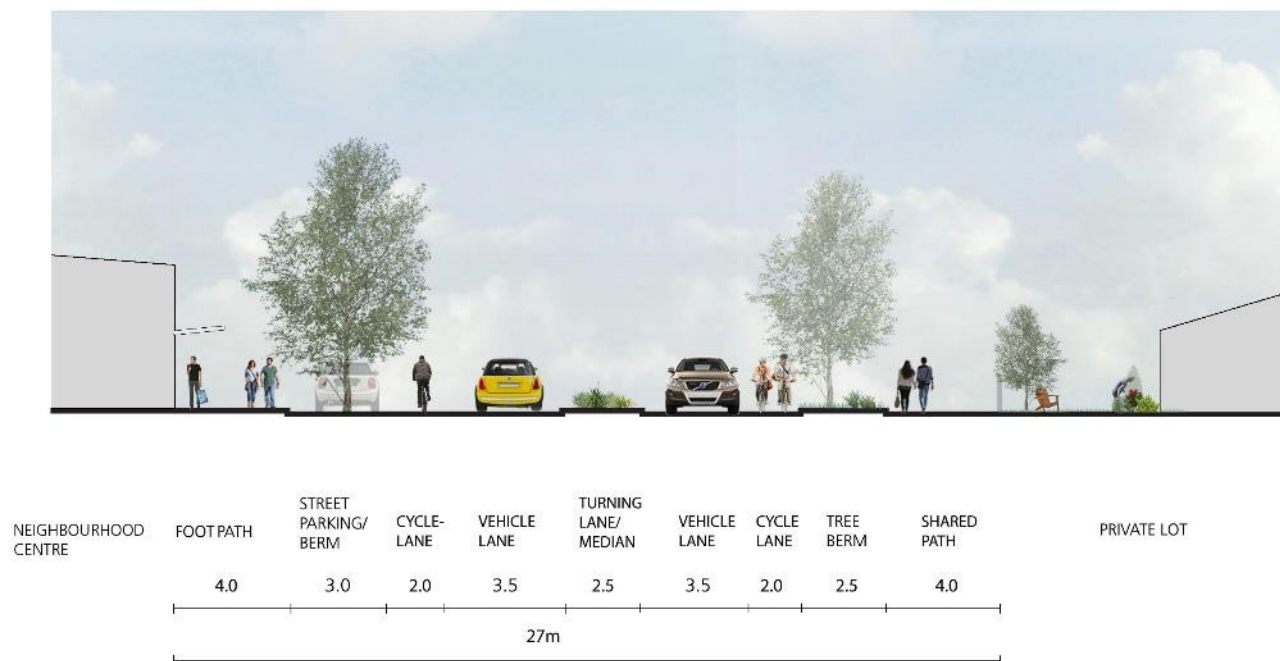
Indicative cross section of the Cambridge / Hamilton Road
